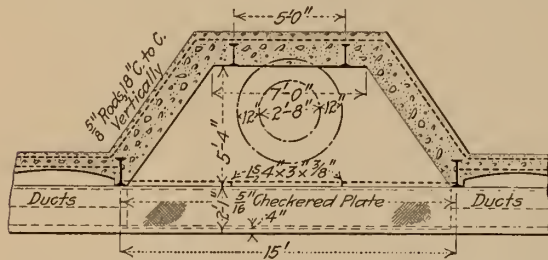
HORIZONTAL SECTION OF SUBWAY WALL AT CABLE SPLICING CHAMBER AND VERTICAL SECTION THROUGH MANHOLE
